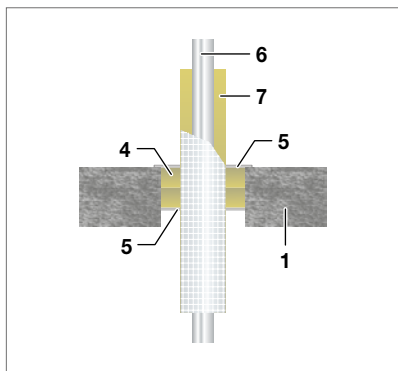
Soft firestop in the solid ceiling with Viega piping system metal
